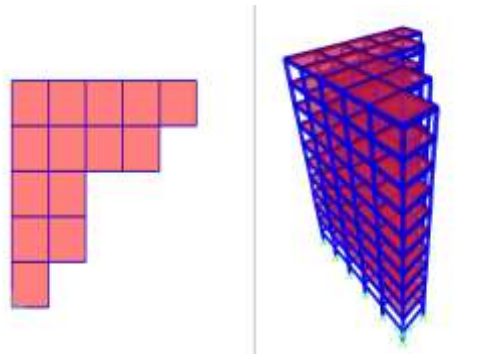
Plan and 3D view of L shape G+9 building in SAP2000
